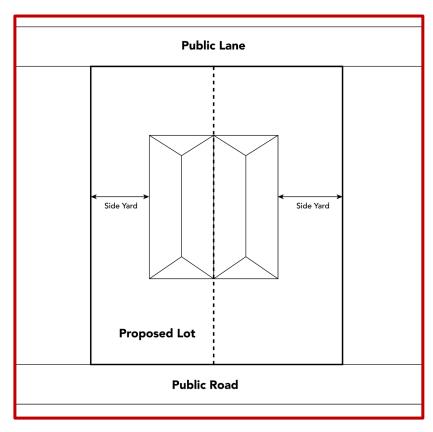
Splitting Semi-Detached Dwellings On Two Separate Lots
